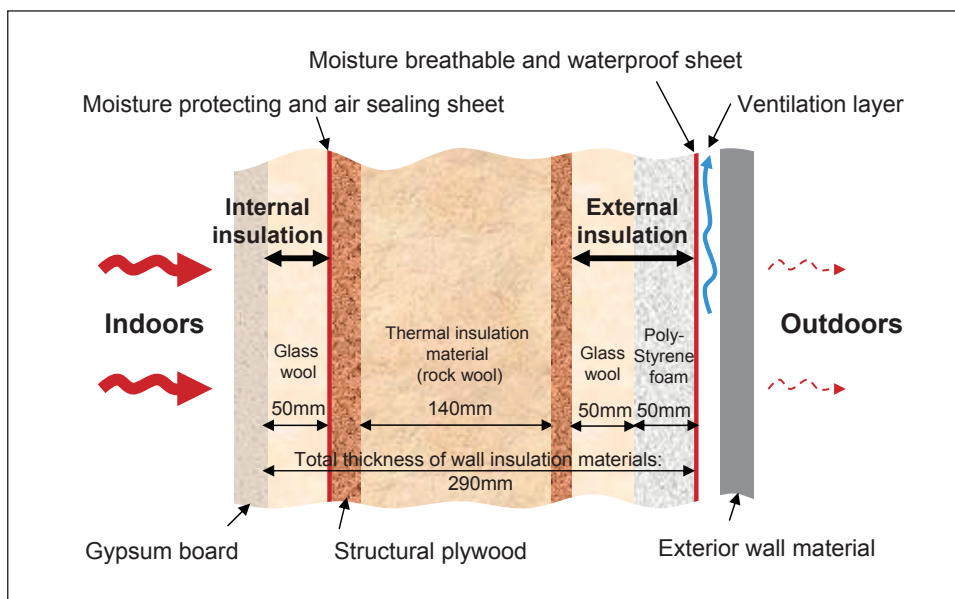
Example of high thermal insulation construction method for internal and external wall insulation
